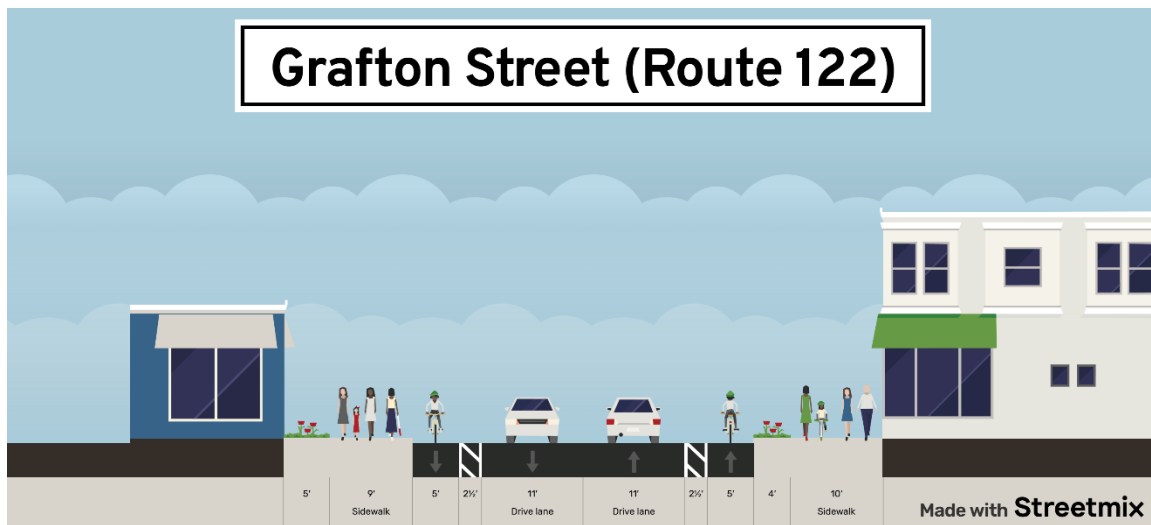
Grafton Street (Route 122) Typical Section Proposed Conditions
